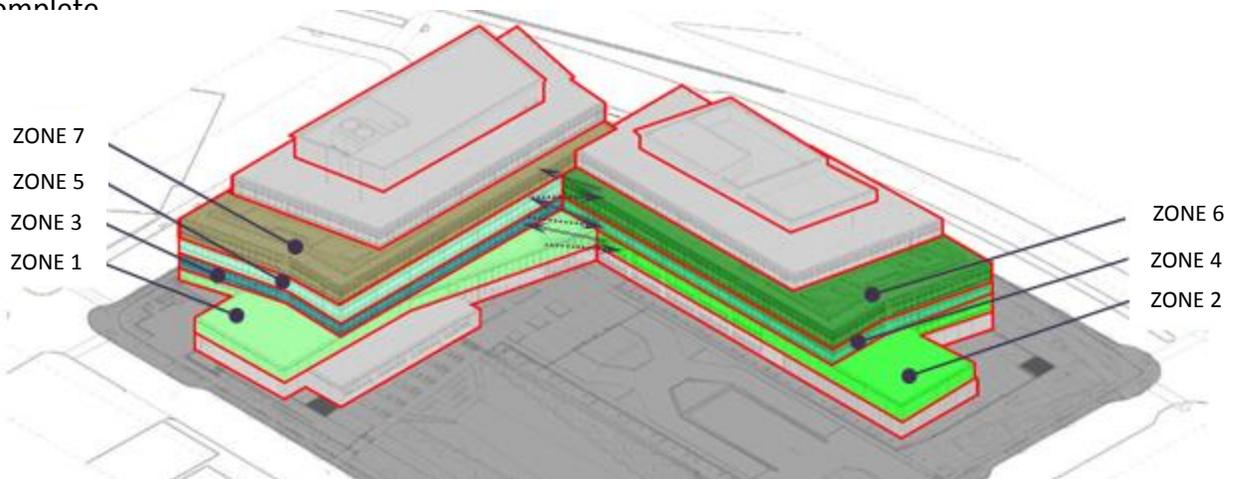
Building Zones Breakdown – Drawing Courtesy of Gensler
